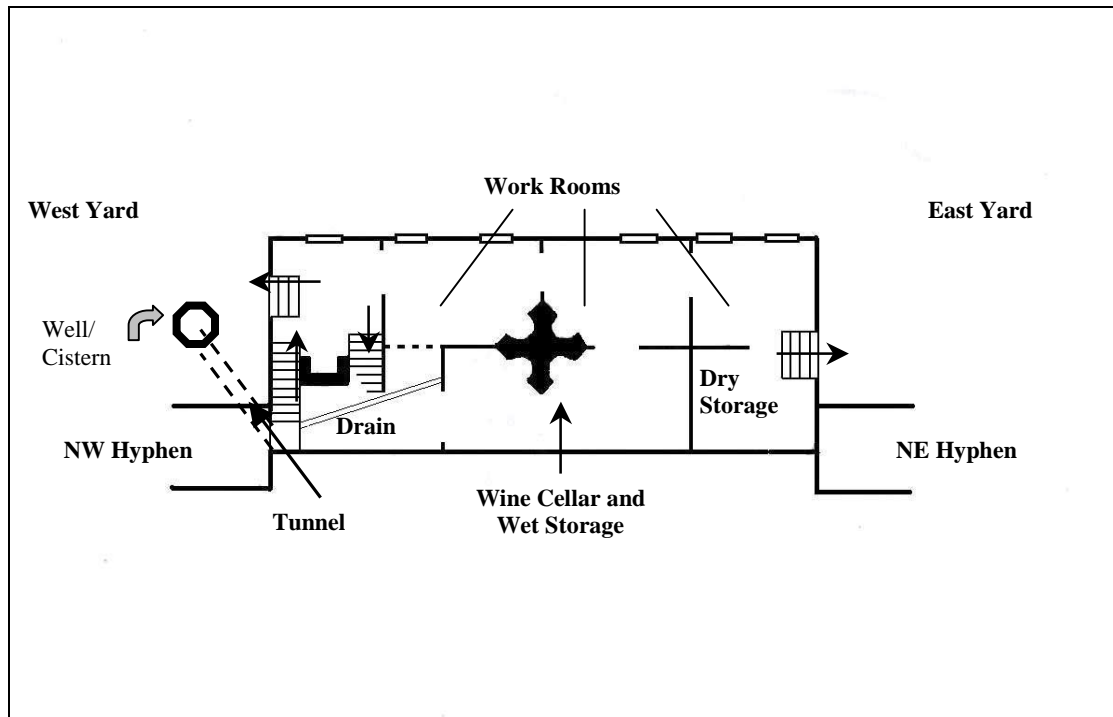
Proposed plan of the Enchanted Castle basement.
